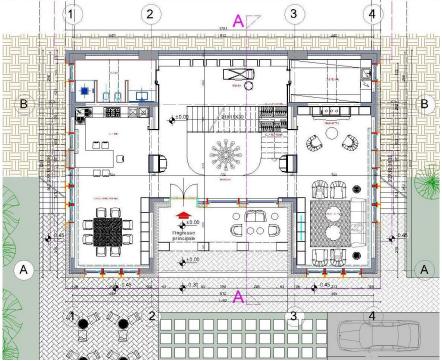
Ground floor (proposed plan) source: Klodjan Xhexhi
